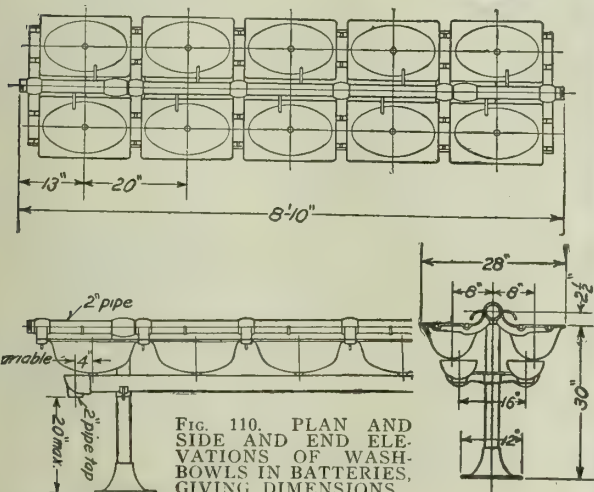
PLAN AND SIDE AND END ELEVATIONS OF WASHBOWLS IN BATTERIES, GIVING DIMENSIONS
